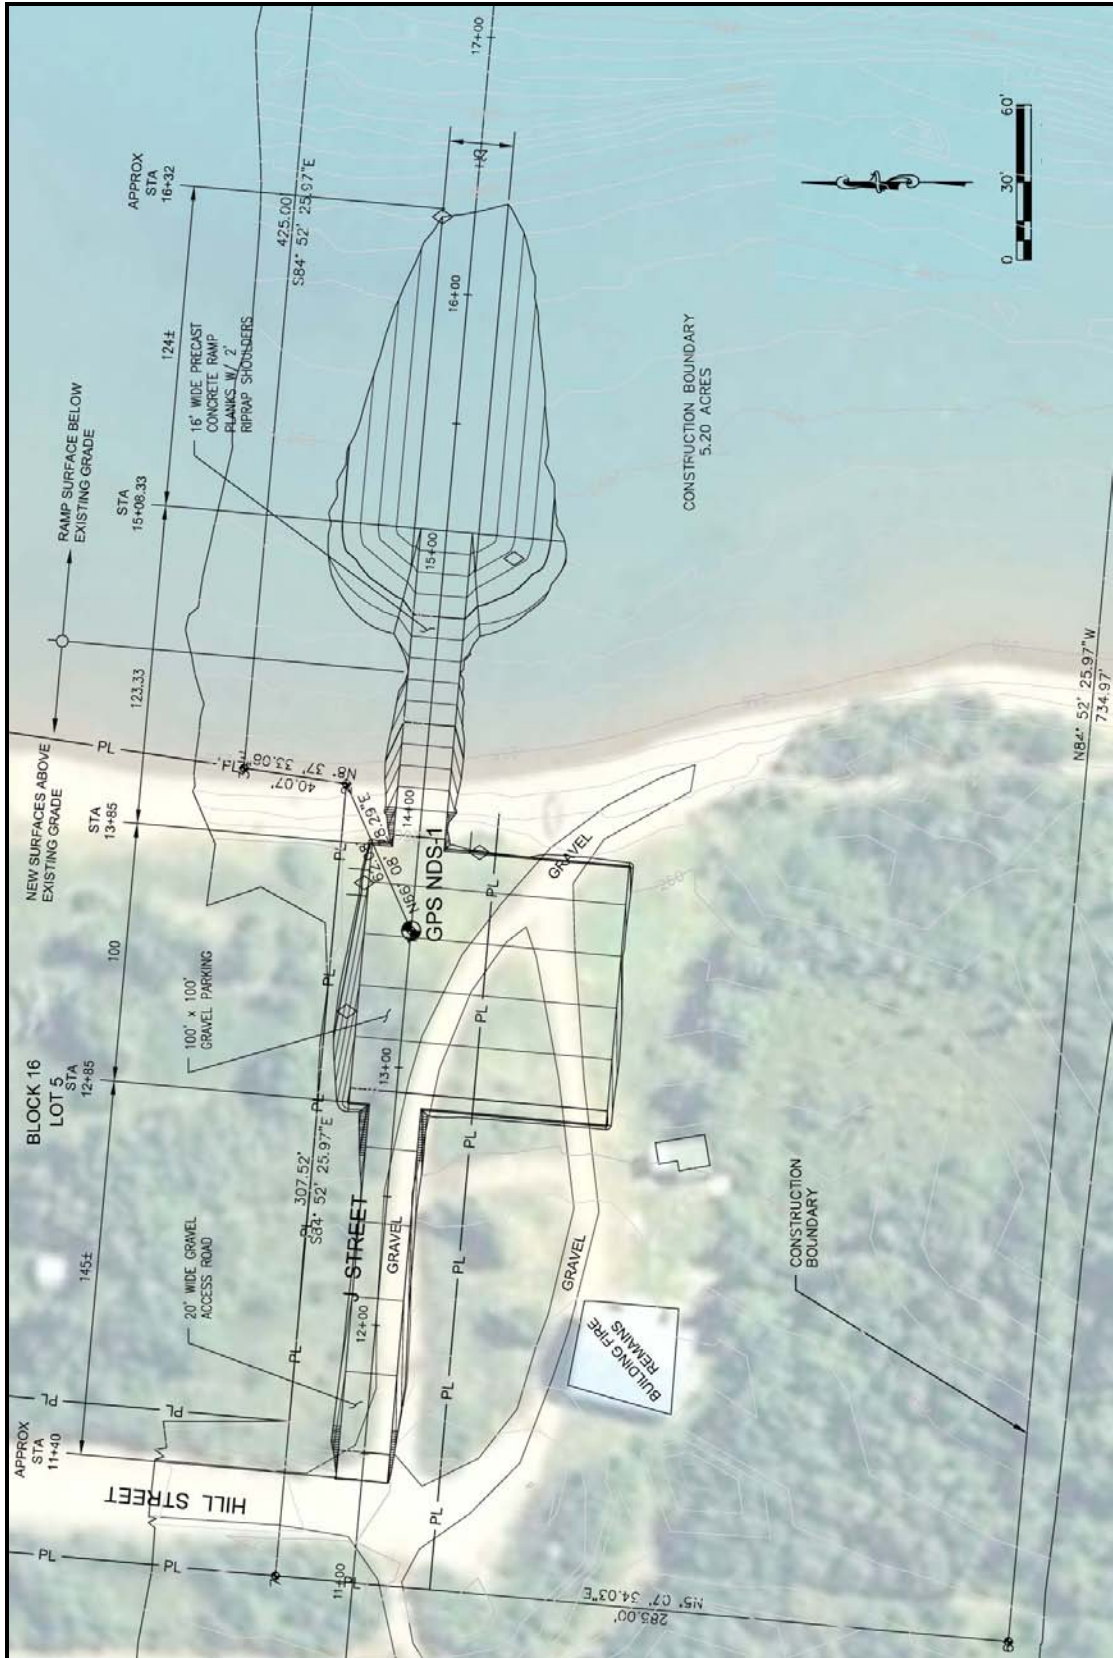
Plan of proposed boat launch ramp and parking lot (excerpted from USACE 2011).
